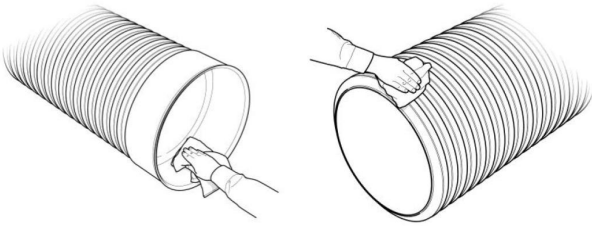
CLEANING SEALING SURFACES OF PIPE
